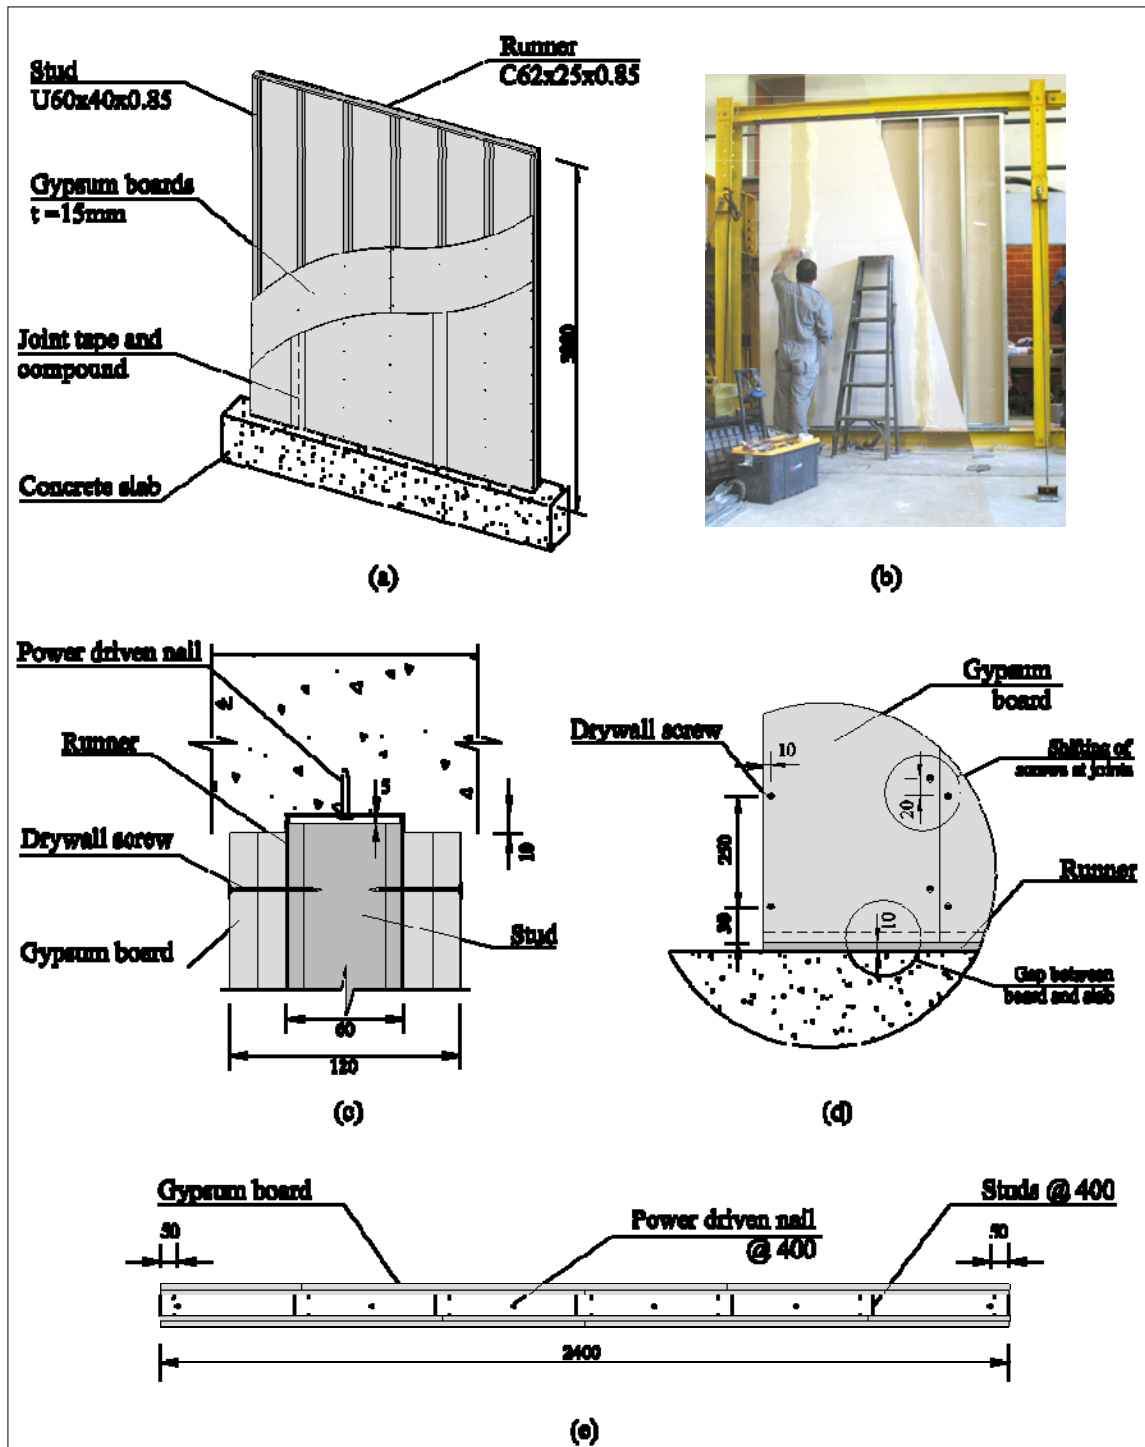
Conventional partition wall description: (a) general scheme, (b) photo of PW showing the inner framing, (c) section of top connection to slab, (d) corner detail of PW, and (e) plan section.
